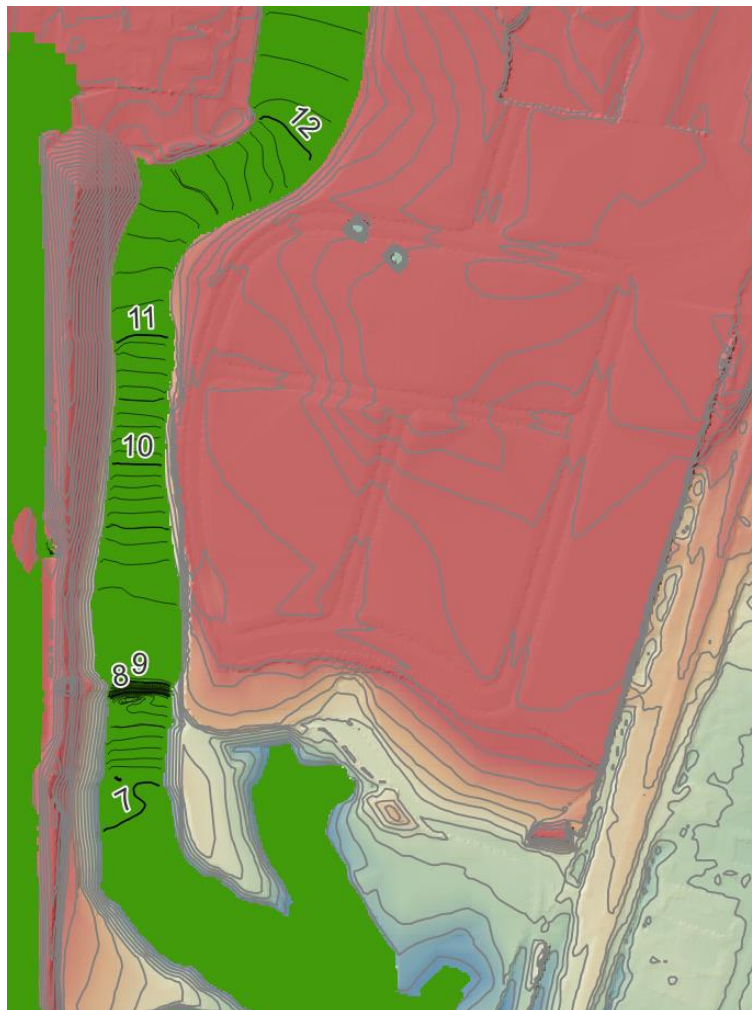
Flood Planning Area (green) and Flood Planning Levels (0.1m contours) around the Stage 2-4 Civil Works area
